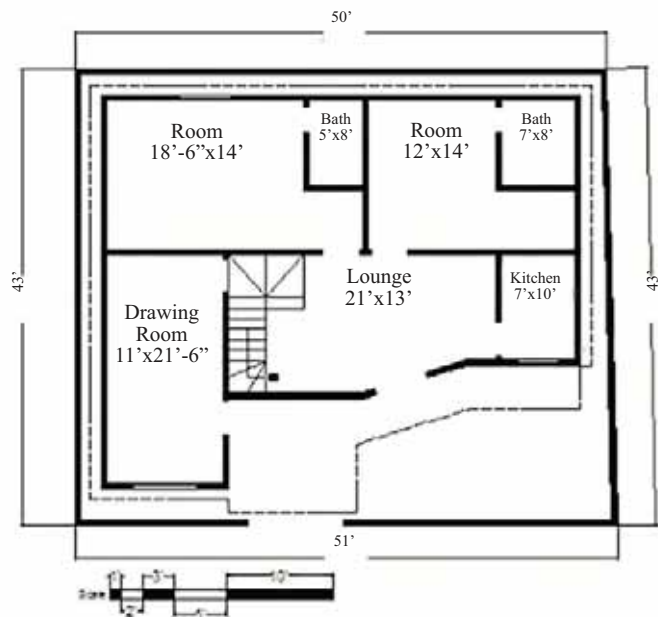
Plan and views of house no. 3, Dub no. 1.
